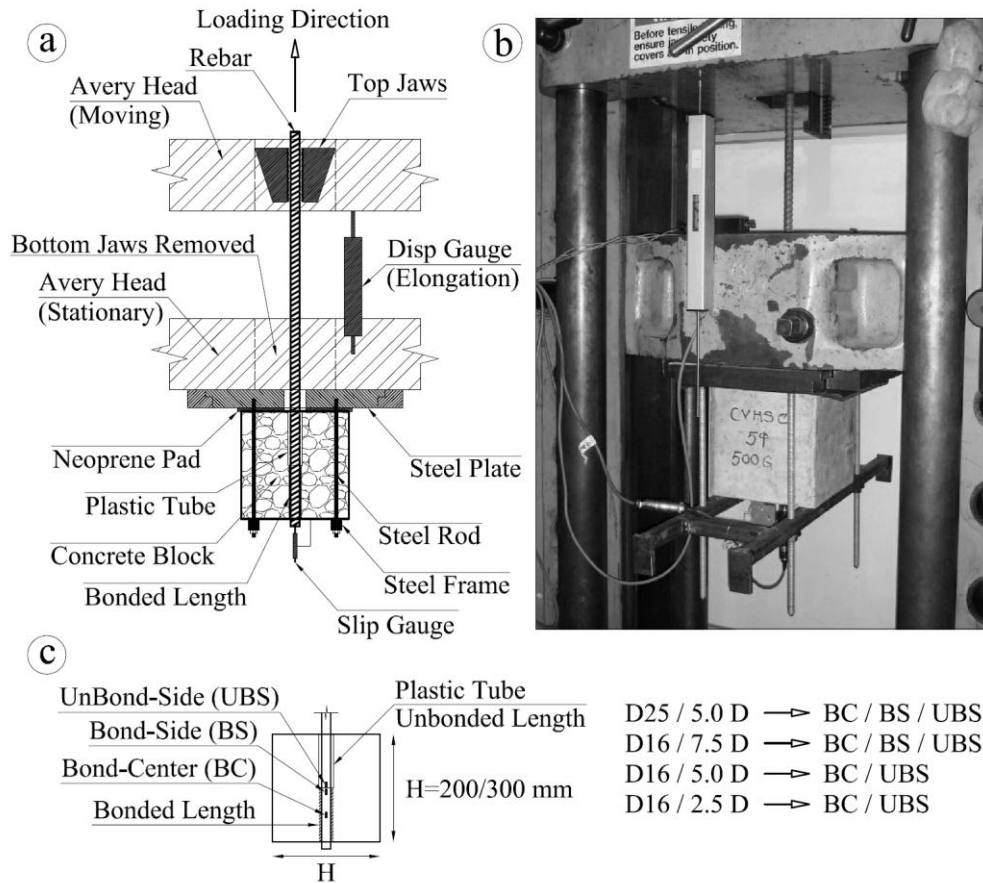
Details of test setup (a), pull-out specimens (b) and strain gauge detailing (c)
